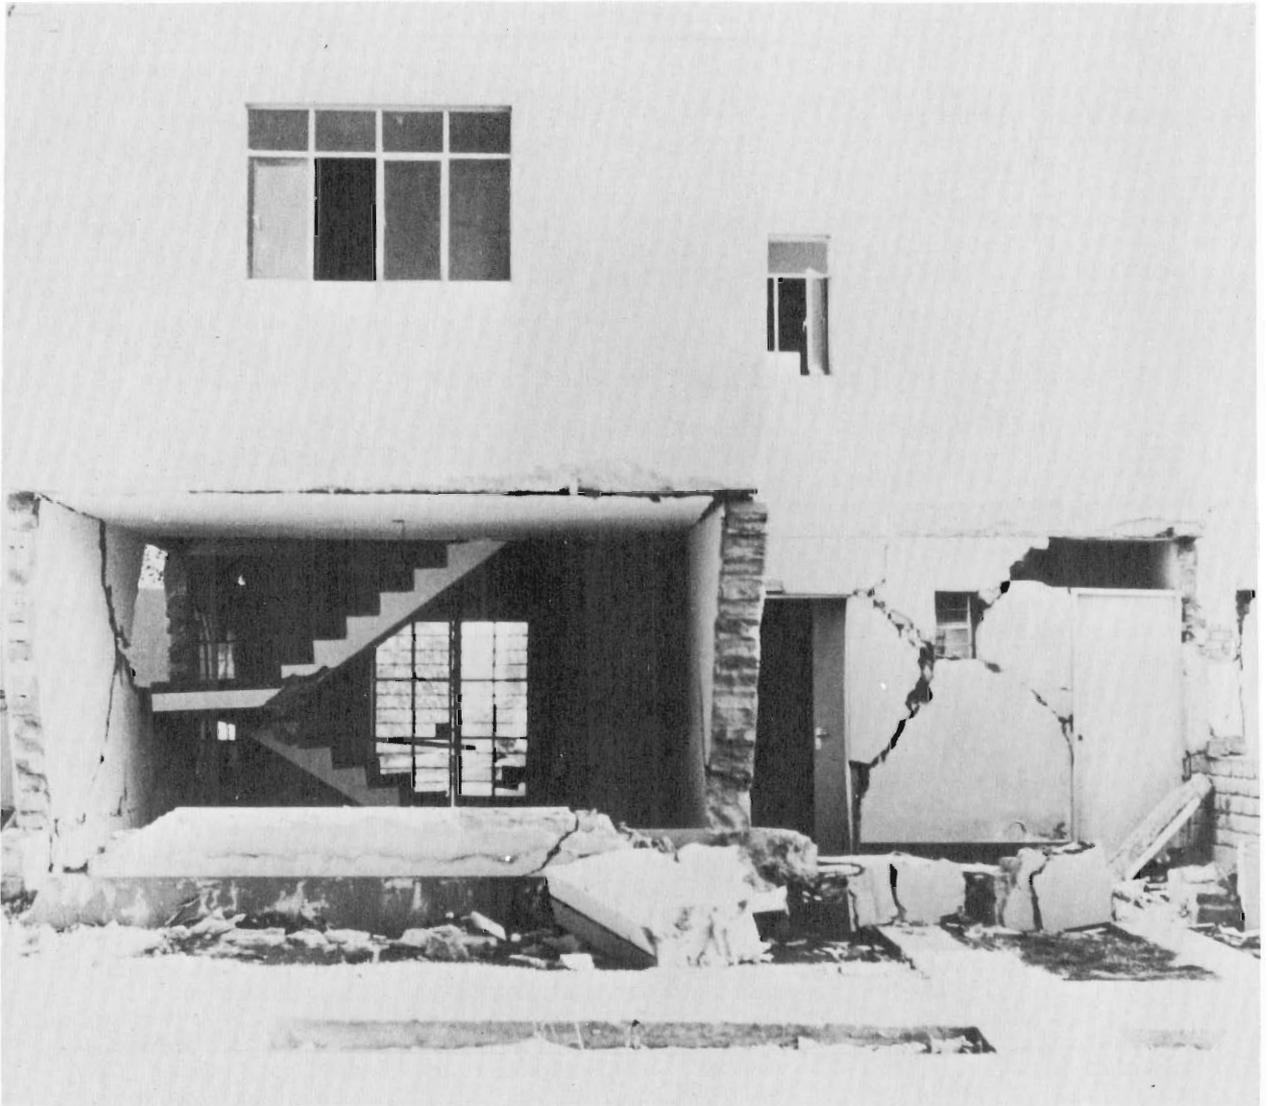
Destruction of new home of unreinforced brick construction in the Buenos Aires suburb of Chimbote, Peru; all buildings in this suburb were damaged beyond repair. None of the homes collapsed, probably because of the reinforced concrete stairway that connected concrete floor slabs.
